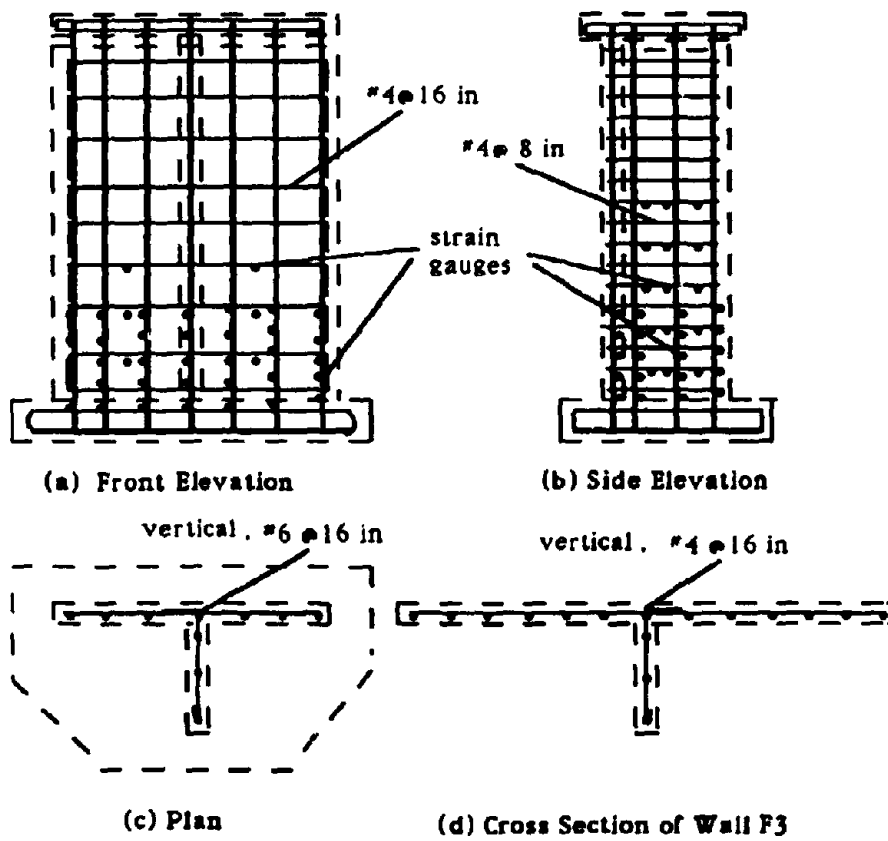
Reinforcement Arrangement, and Strain Gauge Locations
